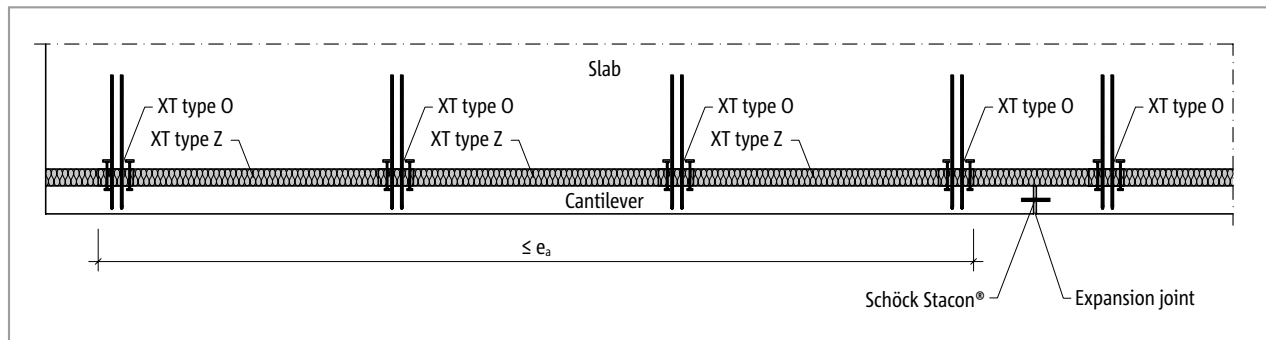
Schöck Isokorb® XT type O: Expansion joint arrangement
